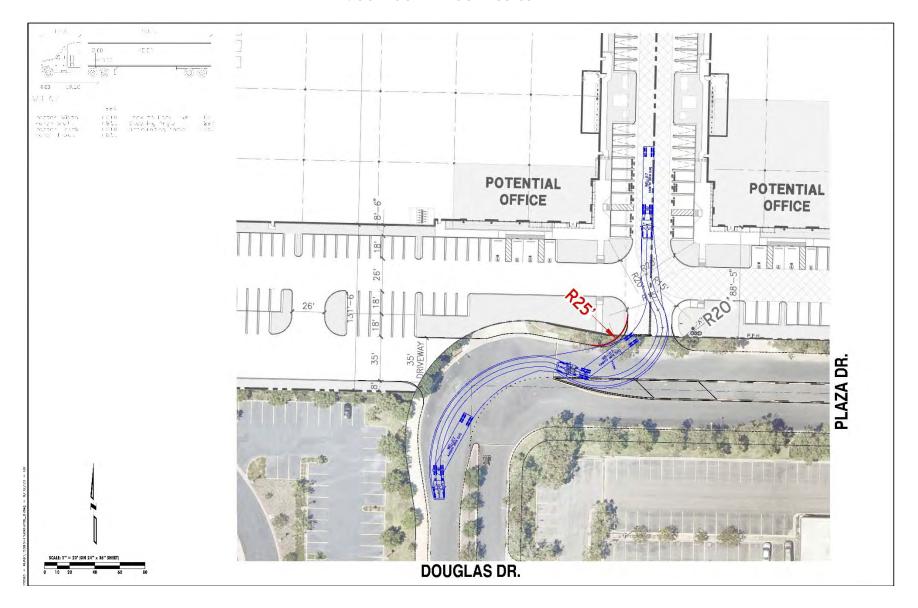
INBOUND ON-SITE TRUCK CIRCULATION VIA DRIVEWAY 2
